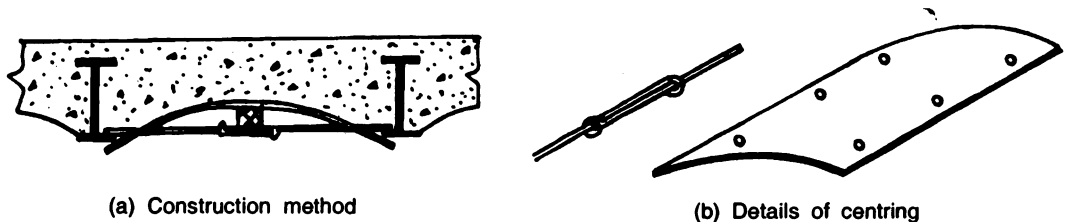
Cement concrete jack arch flooring with steel joists.
